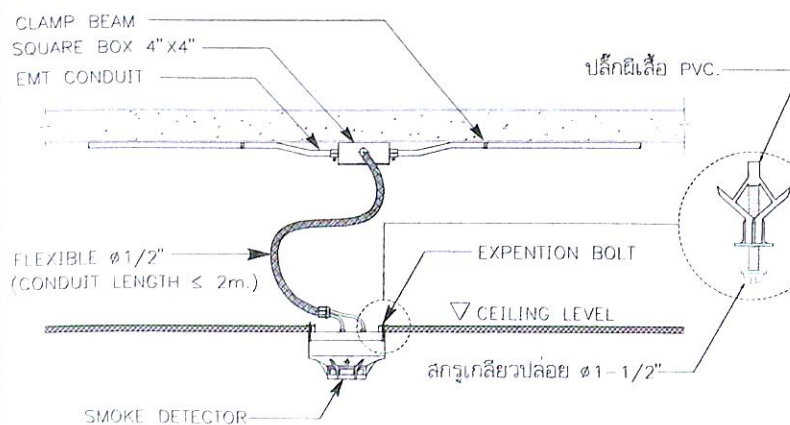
DETAIL : CONDUIT & SQUARE BOX INSTALLATION (TYP)
